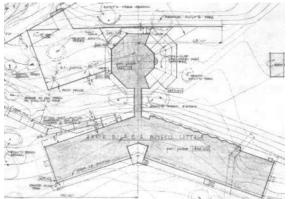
Detail of Buildings 6 and 7 site plan. Source: Site Plan, "Annie E. and E. A. Bushell Cottage, West Oakland Home Corporation," Gerald M. McCue & Associates, Sheet A1, dated October 28, 1957.
